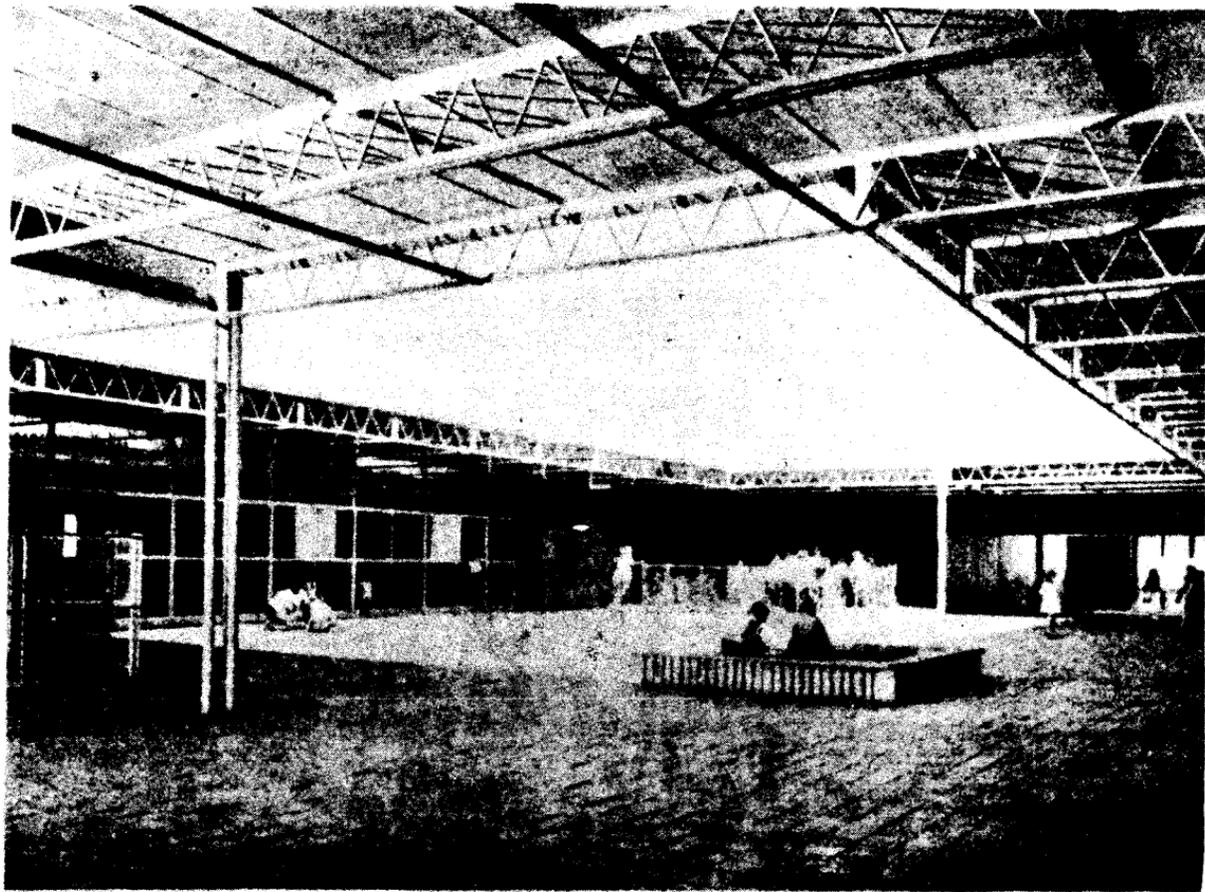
OPEN WEB JOIST ROOF PURLINS FOR ELEMENTARY SCHOOL
